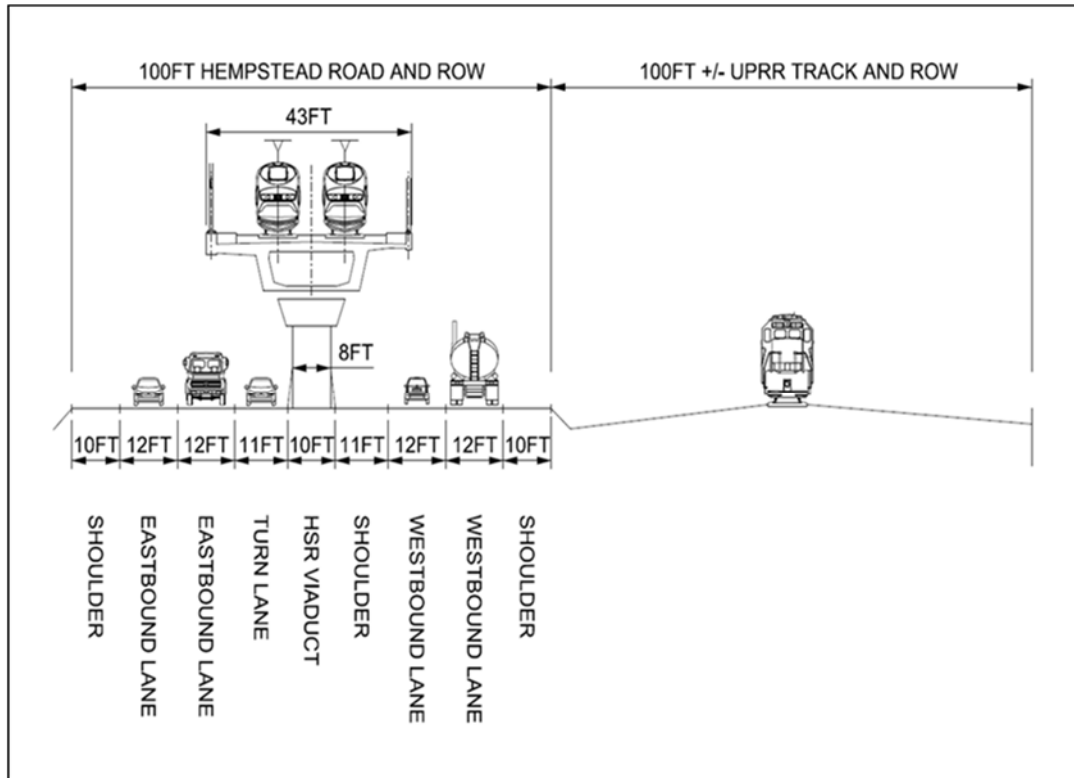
Hempstead Road Configuration 2 – HSR Viaduct in Center of Road
